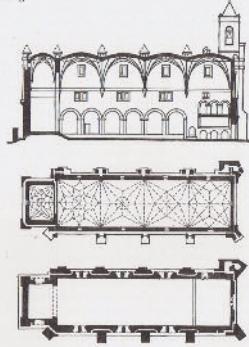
Tepic, Franciscan church, 1541-50. Section and plans
